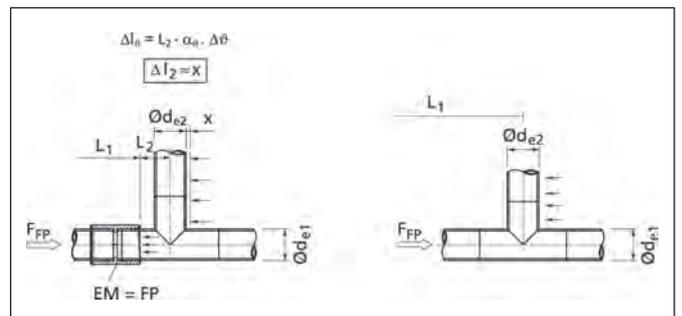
Shear and fixed point forces on tees and 45° branches
